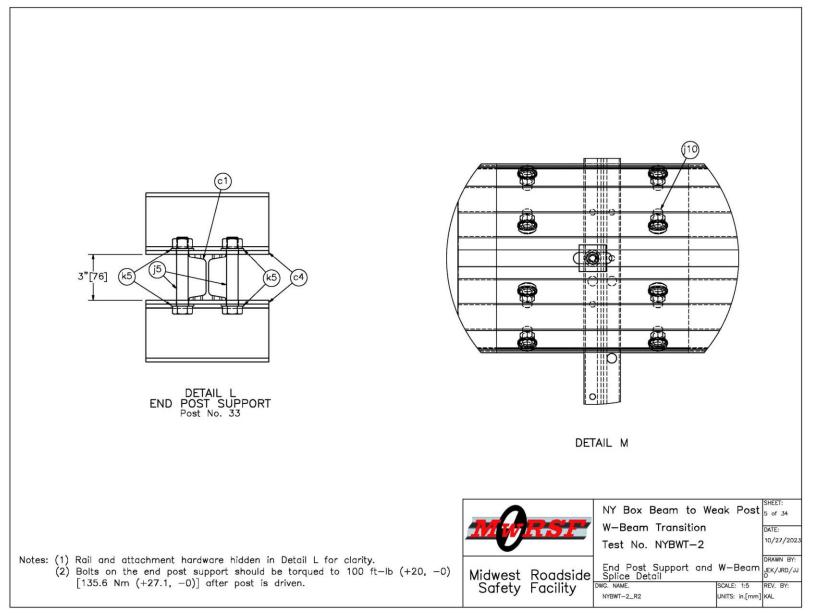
End Post Support and W-beam Splice Detail, Test No. NYBWT-2
